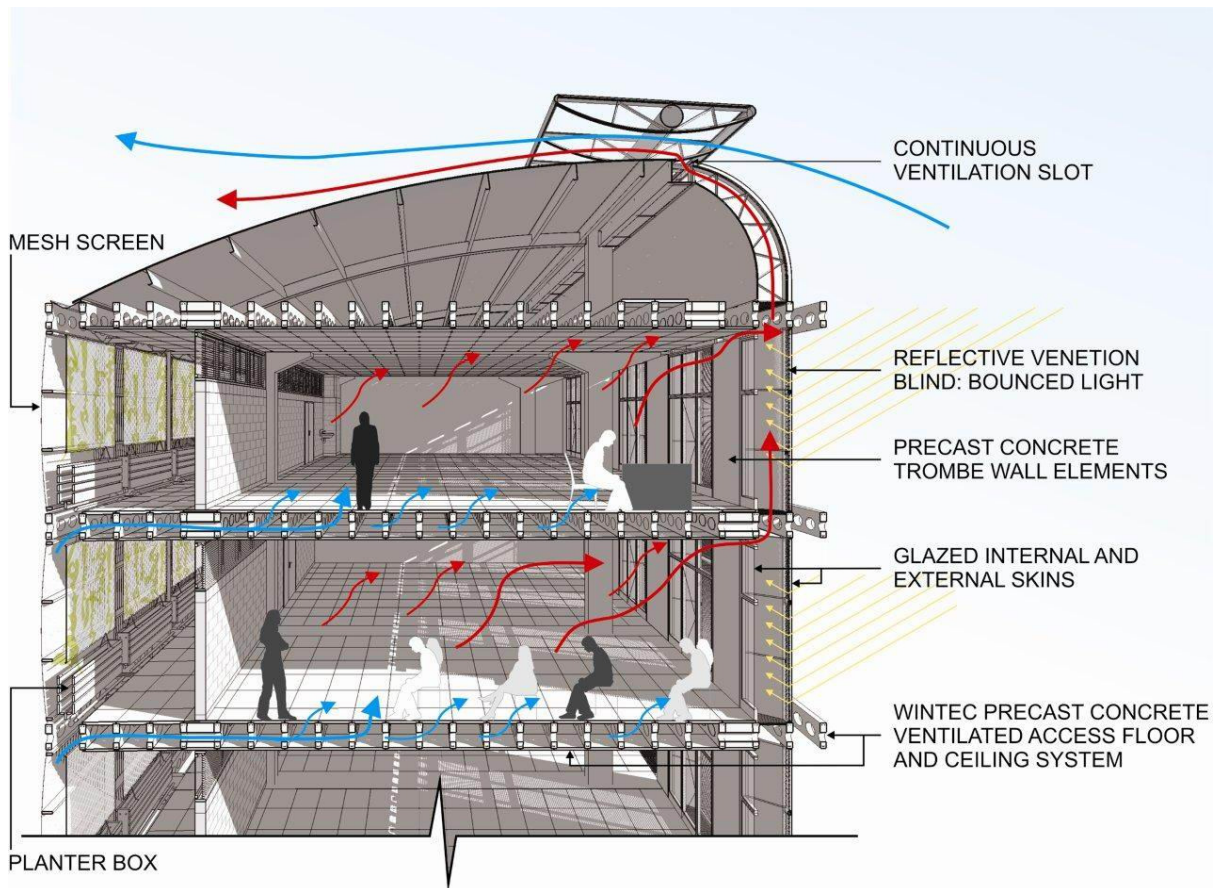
Section through New Auditoria and Teaching Complex illustrating the ventilation paths, trombe wall elements and *Wintec* precast concrete systems (Source: Stratford)
